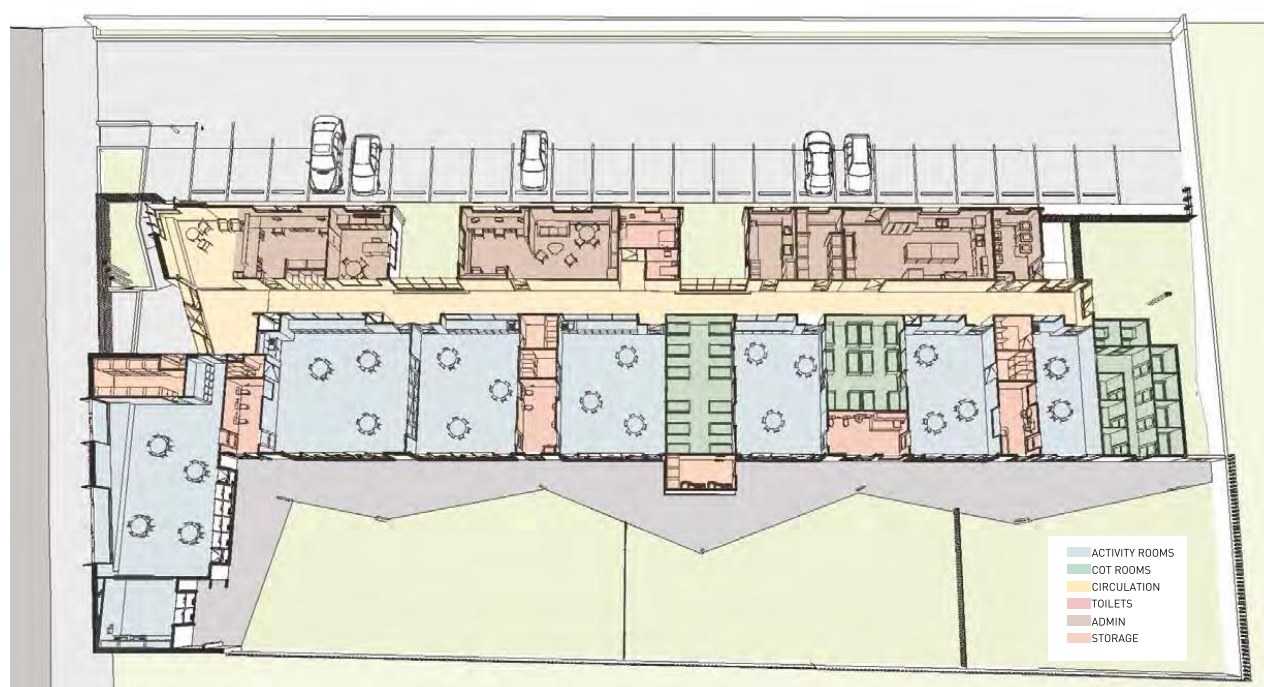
Cutaway plan showing arrangement and relationship between rooms within a child care facility.
